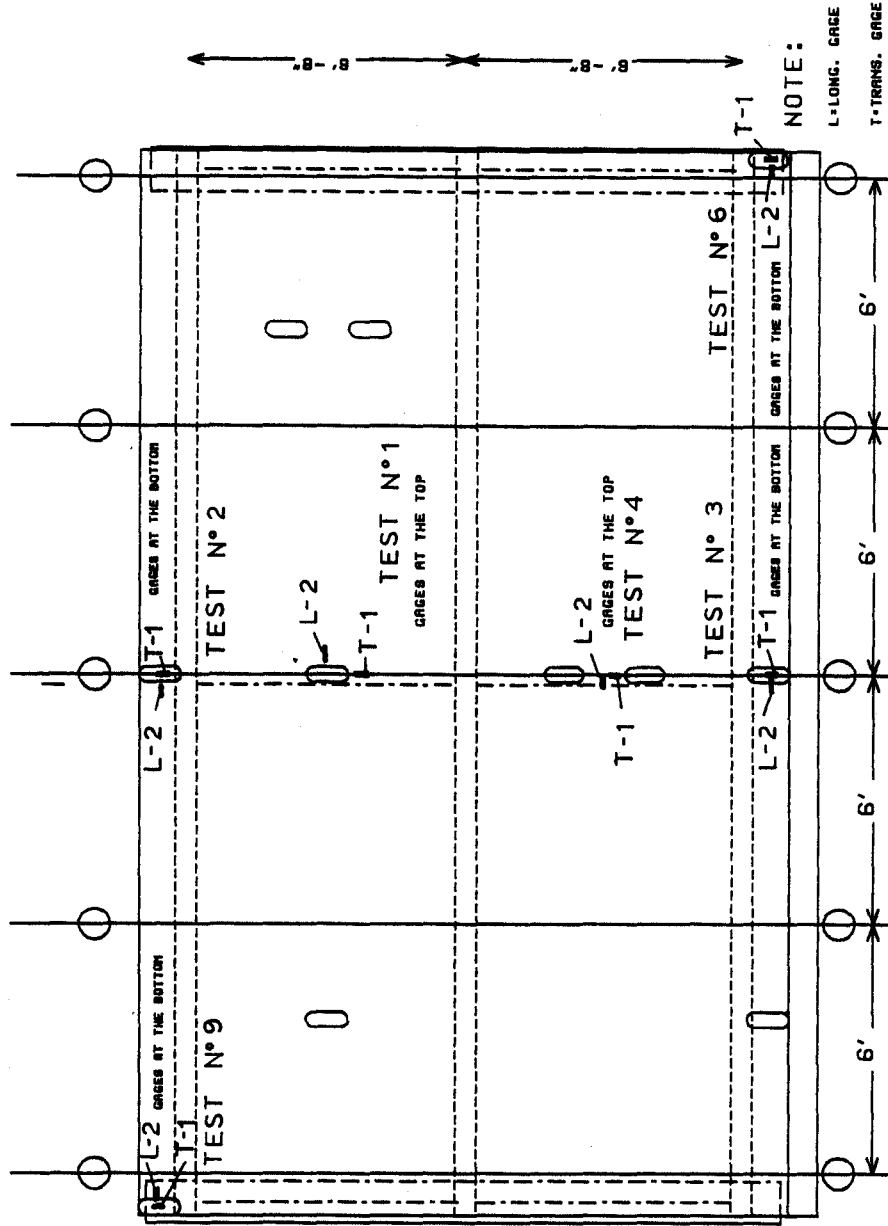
Concrete Strain Gage Locations (First Bridge)
